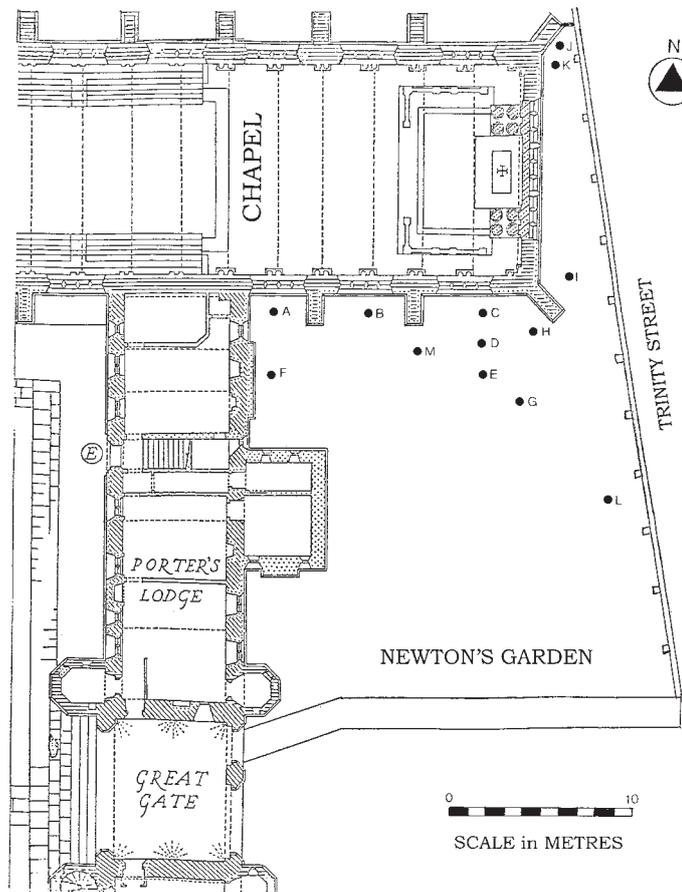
Plan of the site of 'Newton's Garden' as it appears today, showing locations of the thirteen cores. (After Royal Commission.²⁷)
